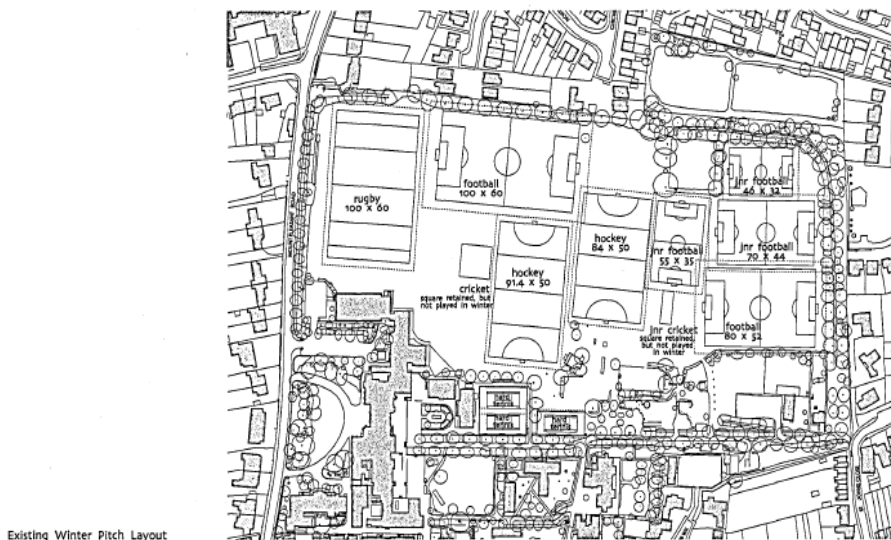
Existing Winter pitch layout for the refused 2007 planning application
